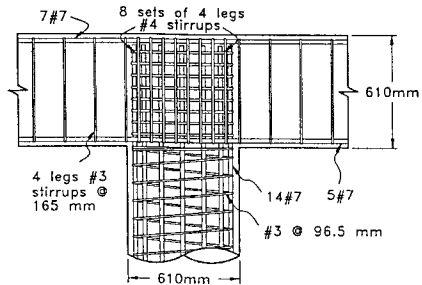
Joint detailing based on the maximum joint shear forces (1 inch = 25.4 mm).
